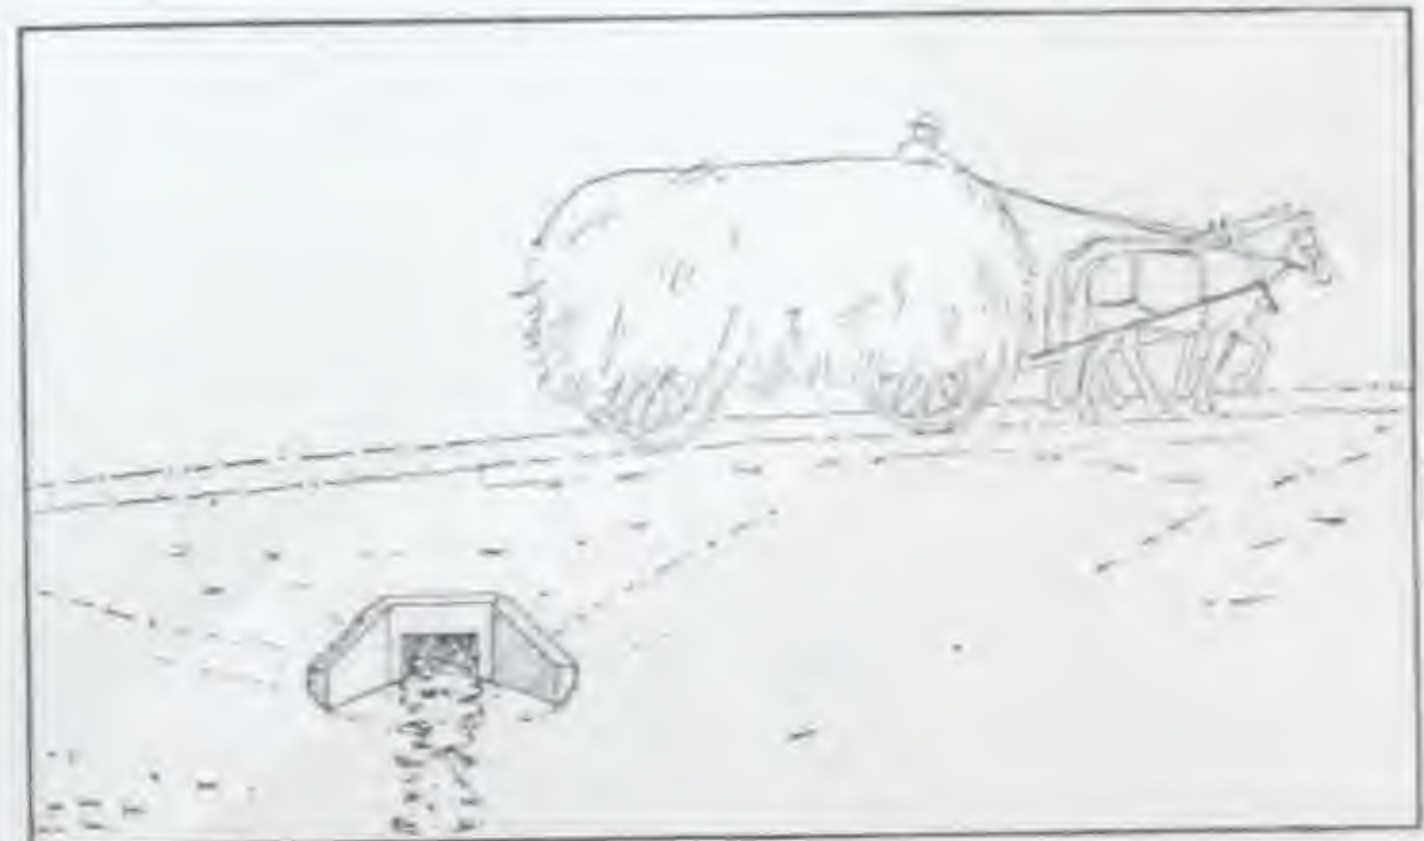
Wear and tear is easily avoided by building a concrete culvert and eliminating steep grades.
